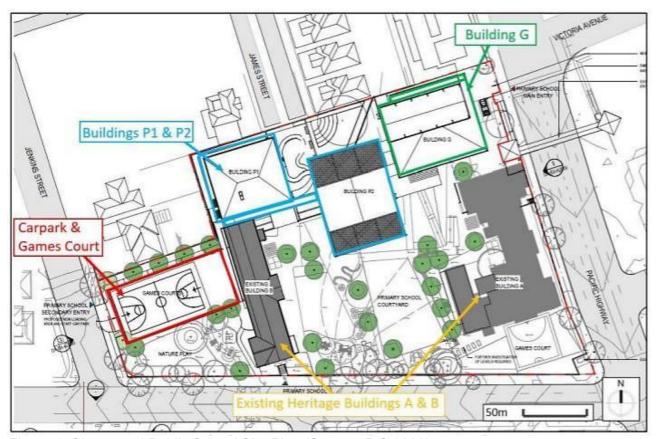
Chatswood Public School Site Plan (Source: RtS 2020)
